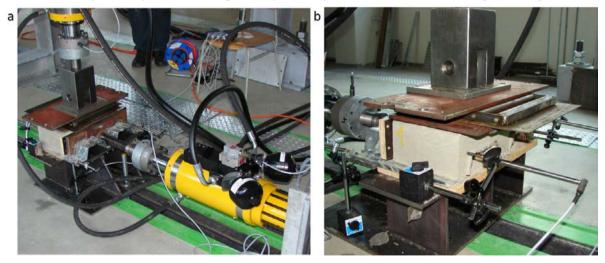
(a) Test arrangement with electrohydraulic loading system; (b) Concrete block measuring devices.
